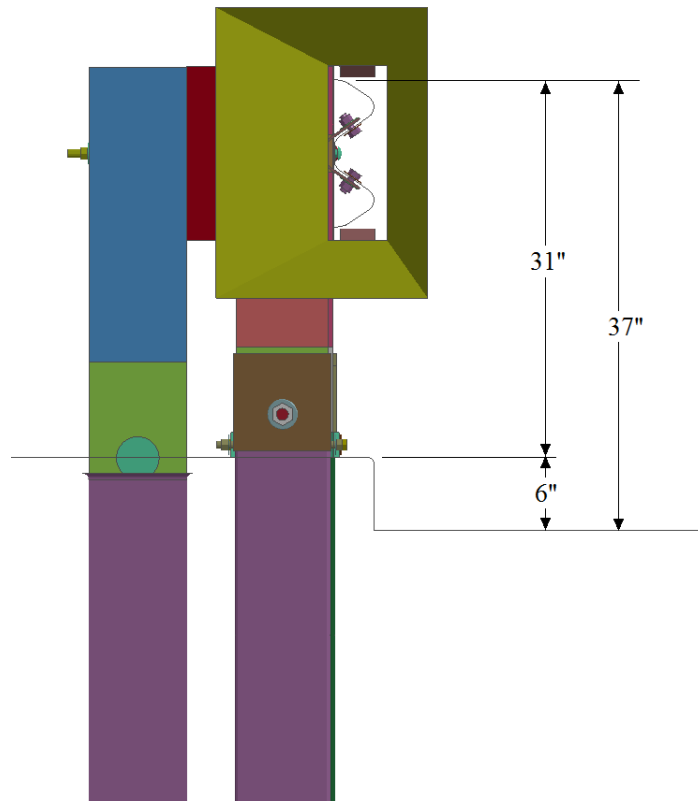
Typical End Terminal Installation Adjacent to 6-in. (152-mm) Tall Curb
